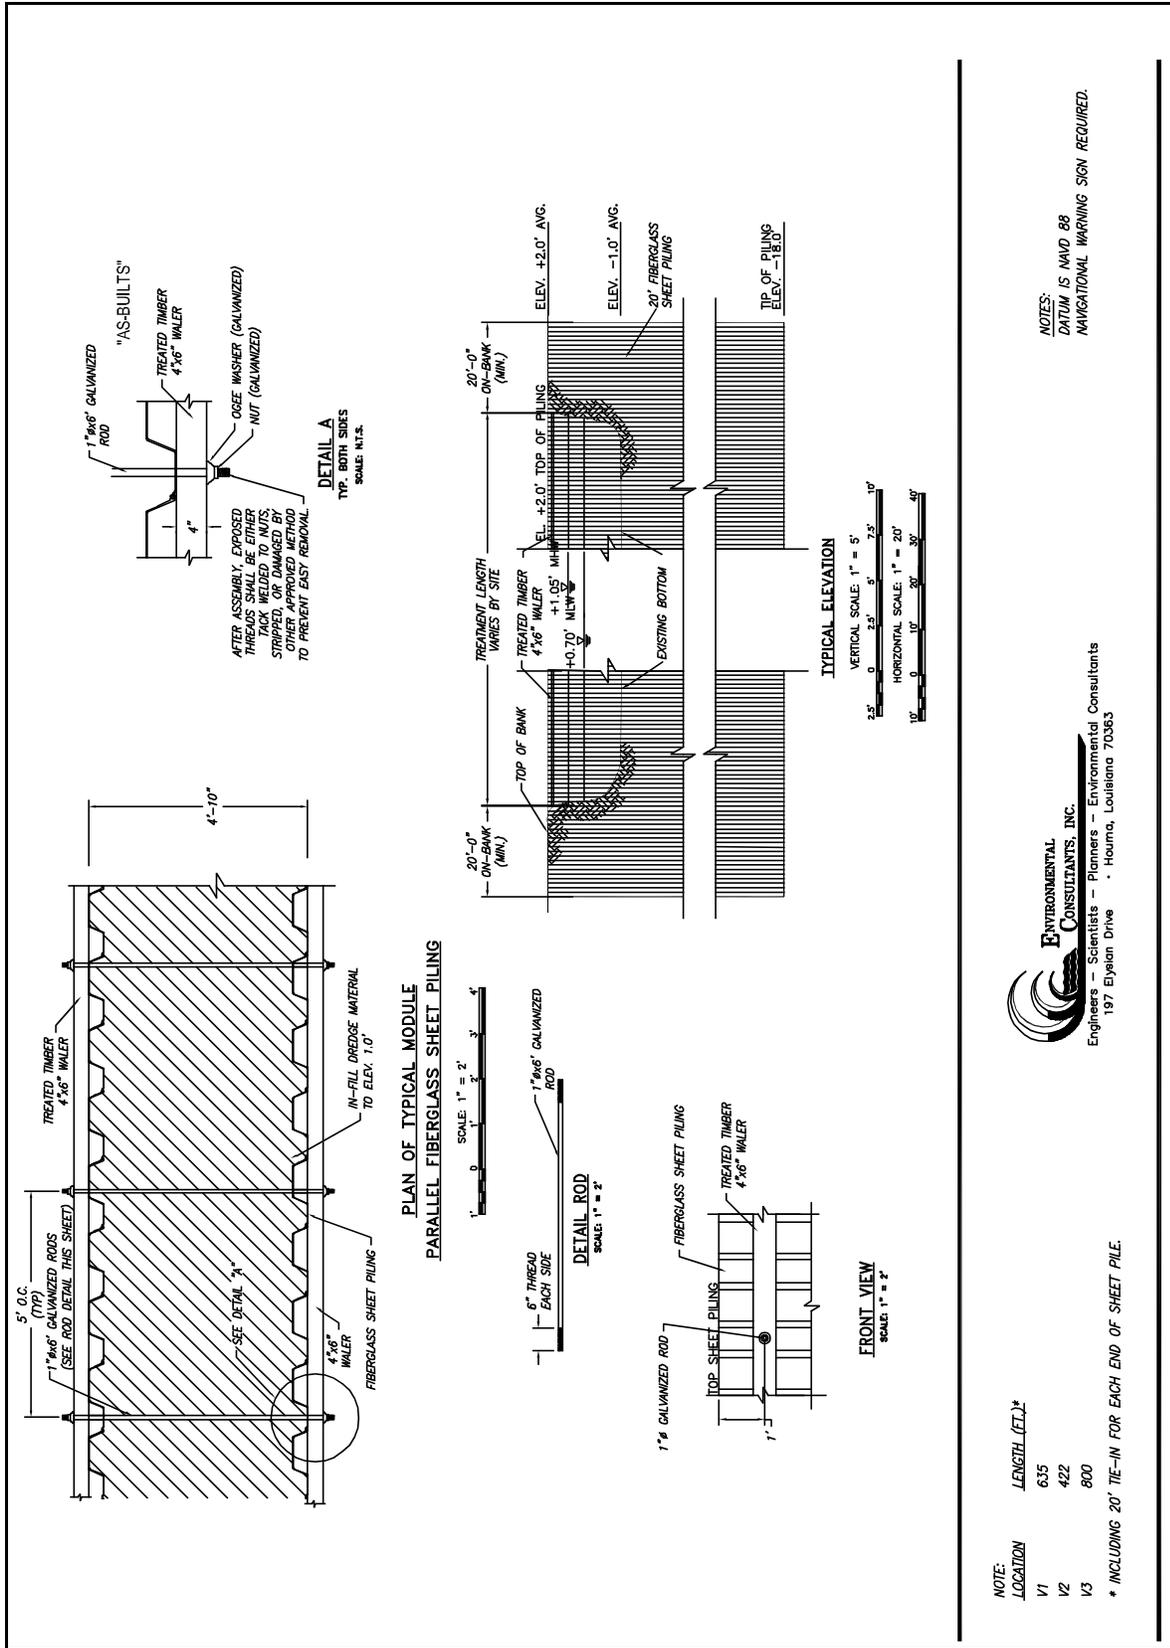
Typical design of parallel fiberglass sheet pile system (treatment V) at the Manaday Bank Protection Demonstration (TE-41) Project (from CEEC 2001, not to scale).
